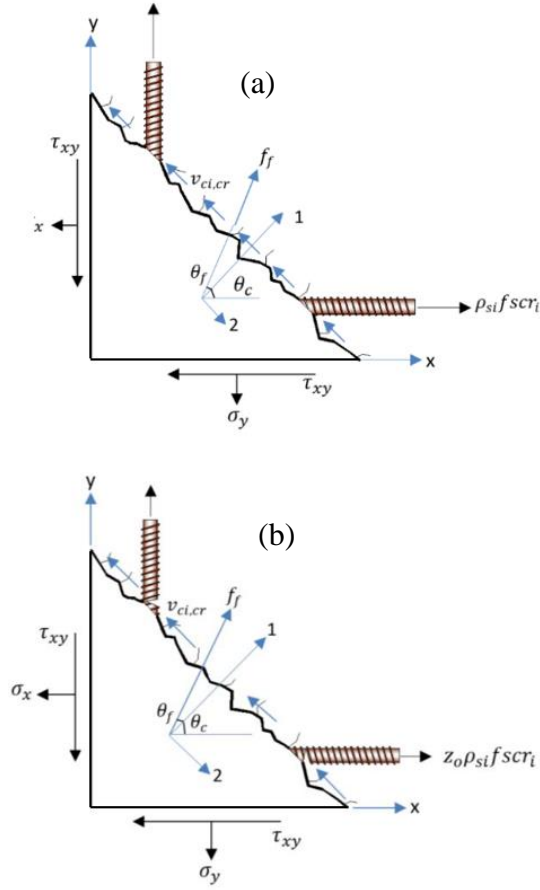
Equilibrium conditions along crack surface after reinforcement crack propagation (a) shows rebar traversing a concrete crack without crack growth. (b) show rebar with crack growth.
